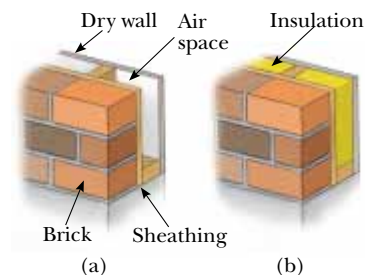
An exterior house wall containing (a) an air space and (b) insulation.
